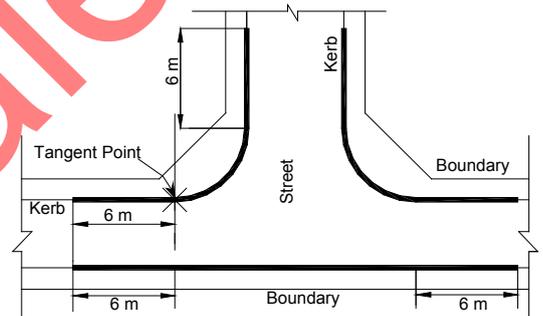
Restricted locations of driveways entry as shown heavy edged lines.
